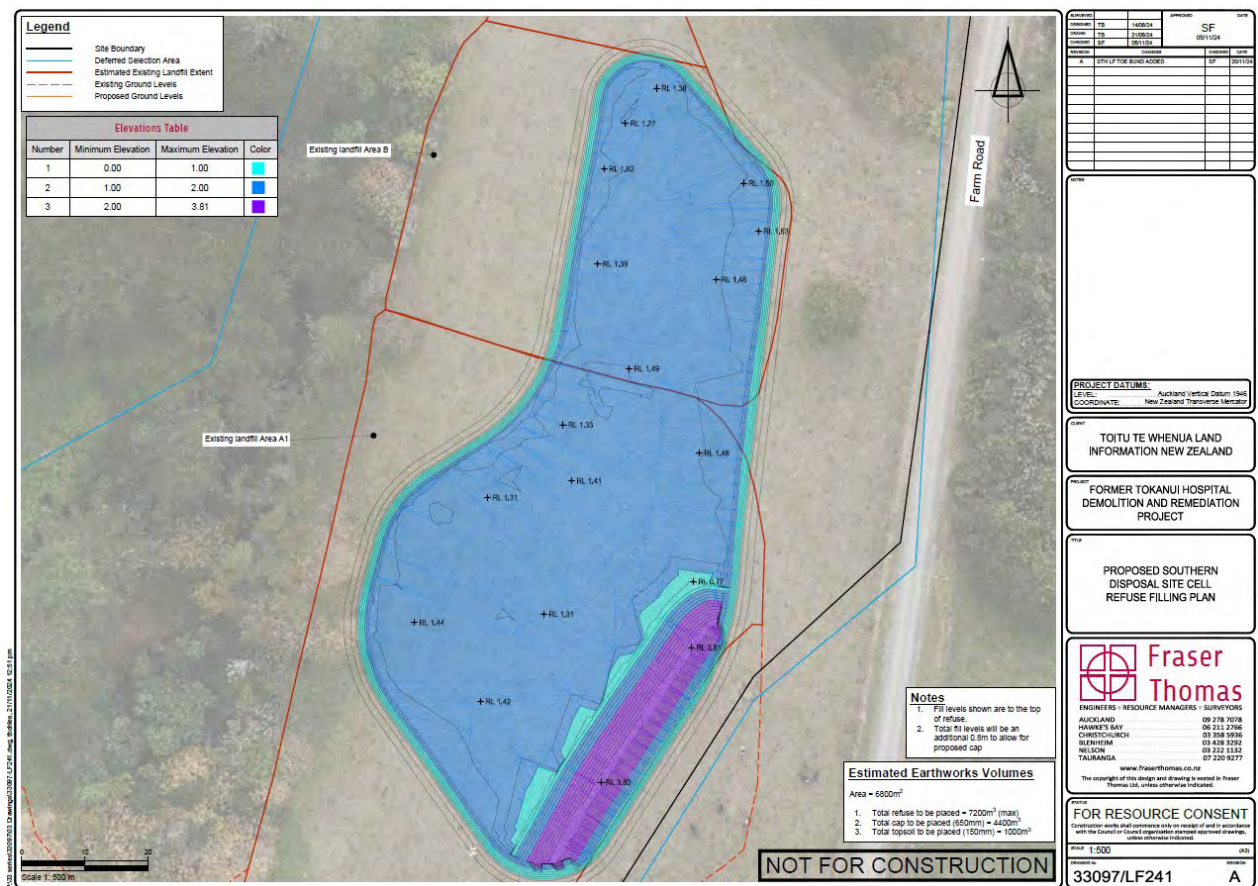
Proposed Southern Disposal Site Cell – Refuse Filling Plan
